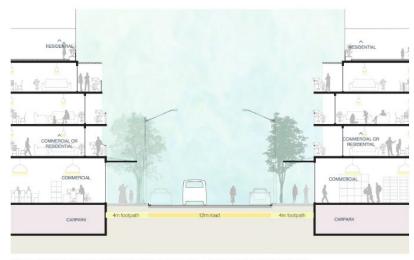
CBD Strategy Extract Illustrative Typical Street Section
